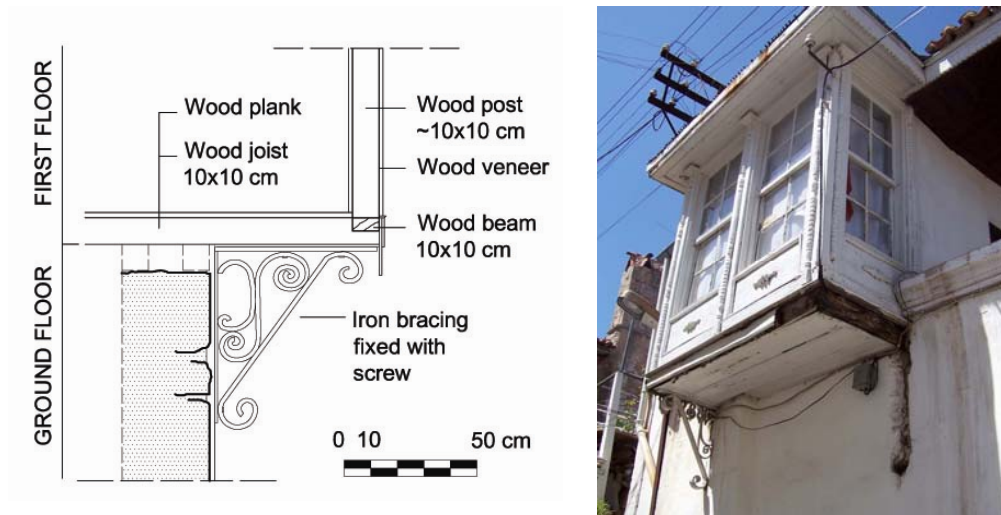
The *cumba* supported with iron bracing (Sekibaşı St. No: 2)
